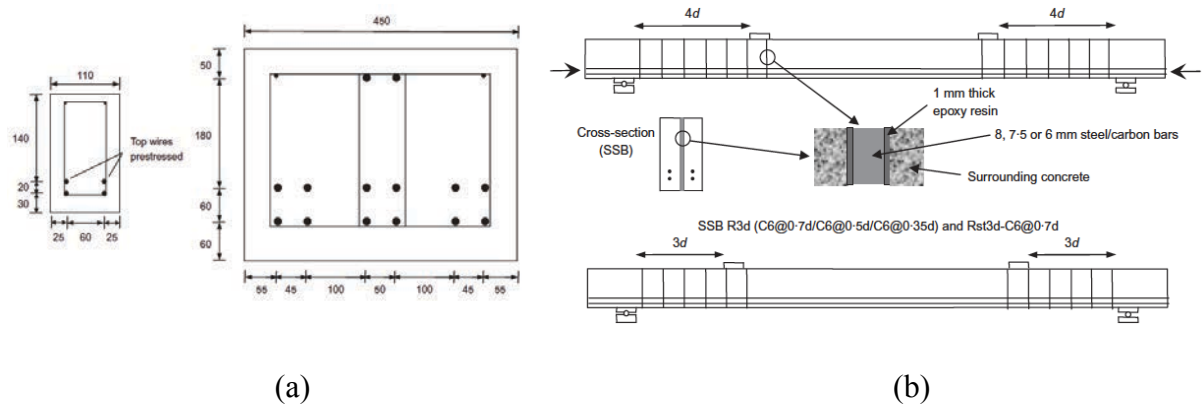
(a) Cross section of test beams; (b) Test layout for the strengthened specimen (Valerio et al., 2009)
